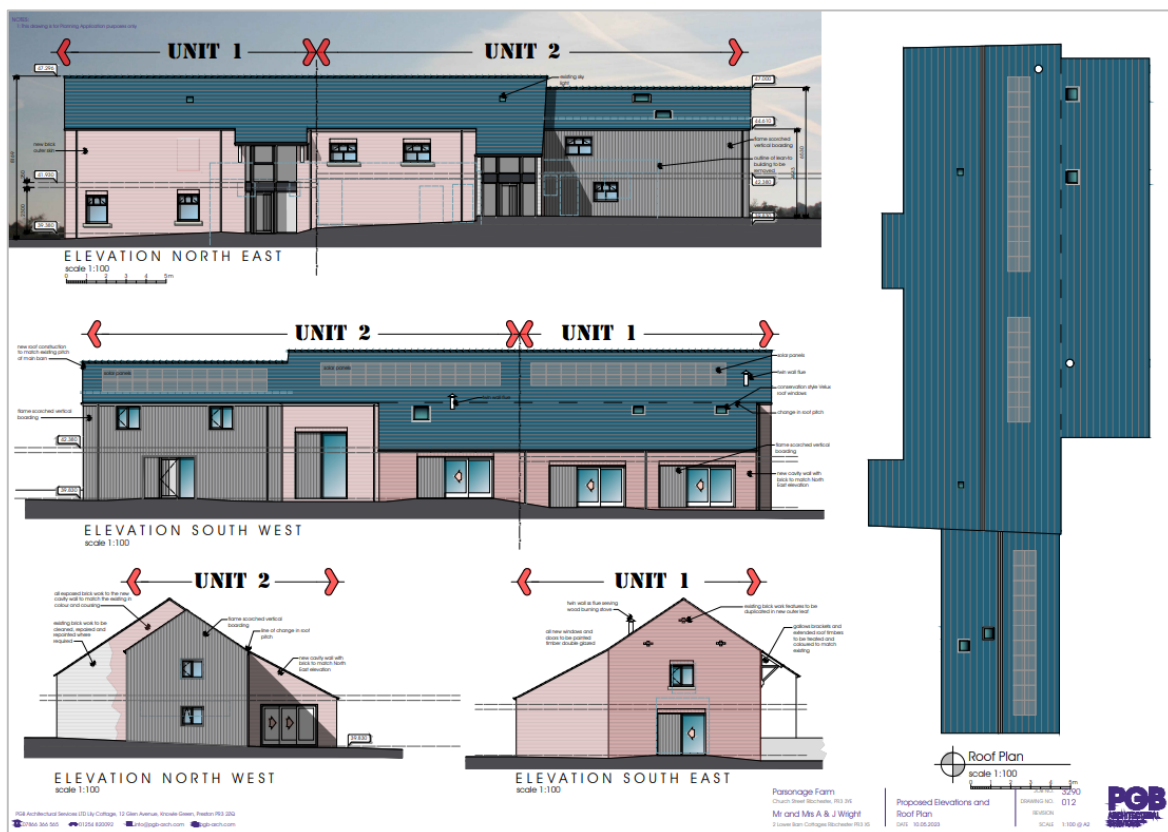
Proposed conversions - elevations and roof plan (showing solar pv cells)
